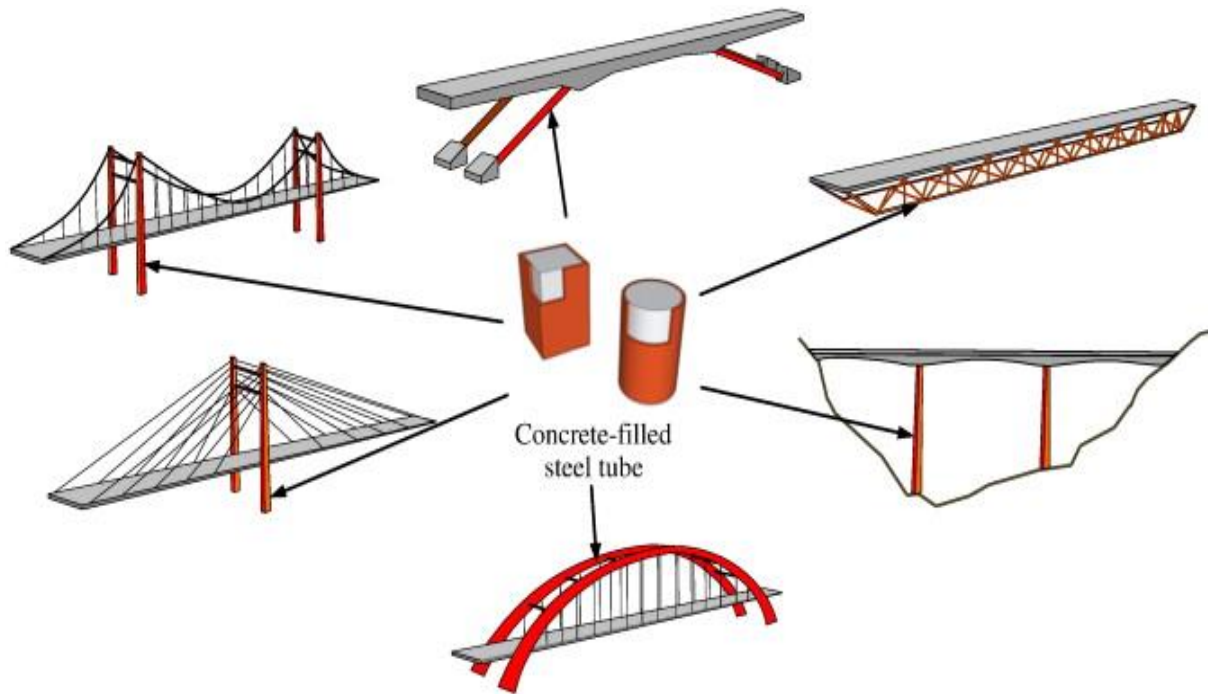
CFT used in bridges [Han et al. 2014b]
